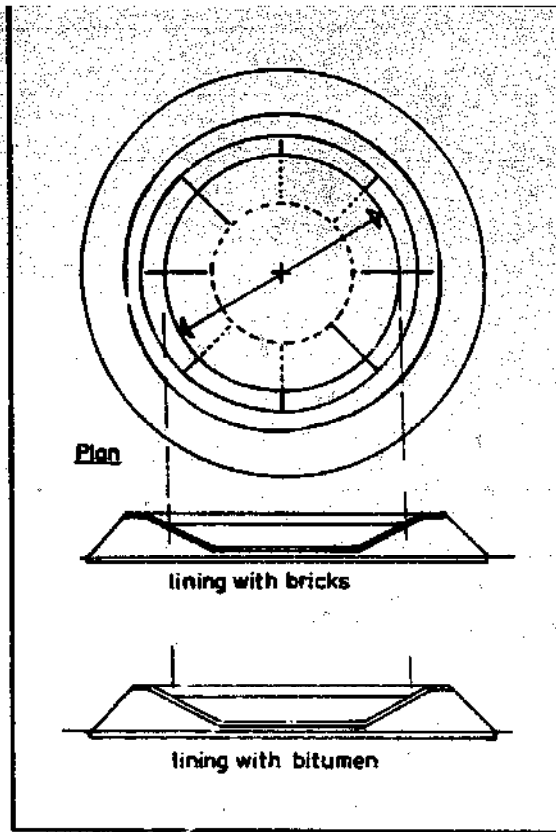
Earth diked reservoir with lining of bricks and bitumen.
